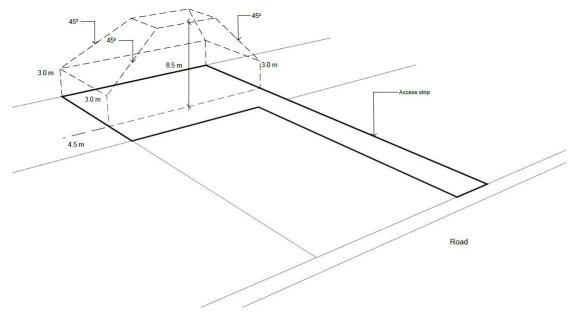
Building envelope for internal lots as required by clause 10.4.2 A3(a)
